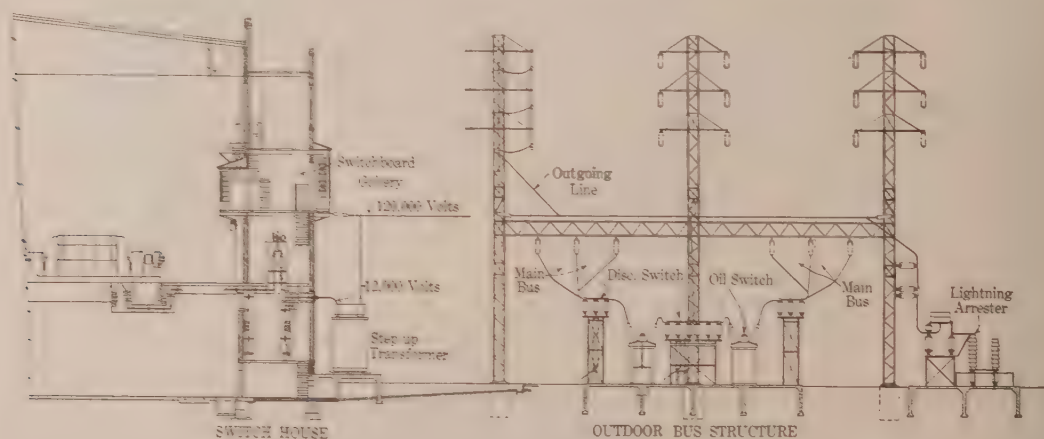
ARRANGEMENT OF ELECTRICAL END OF PLANT
